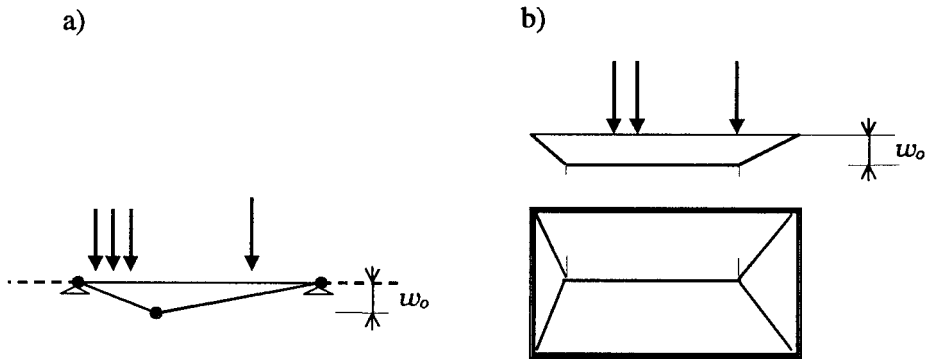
Collapse modes for (a) one-way and (b) two-way slabs at large deflections.
